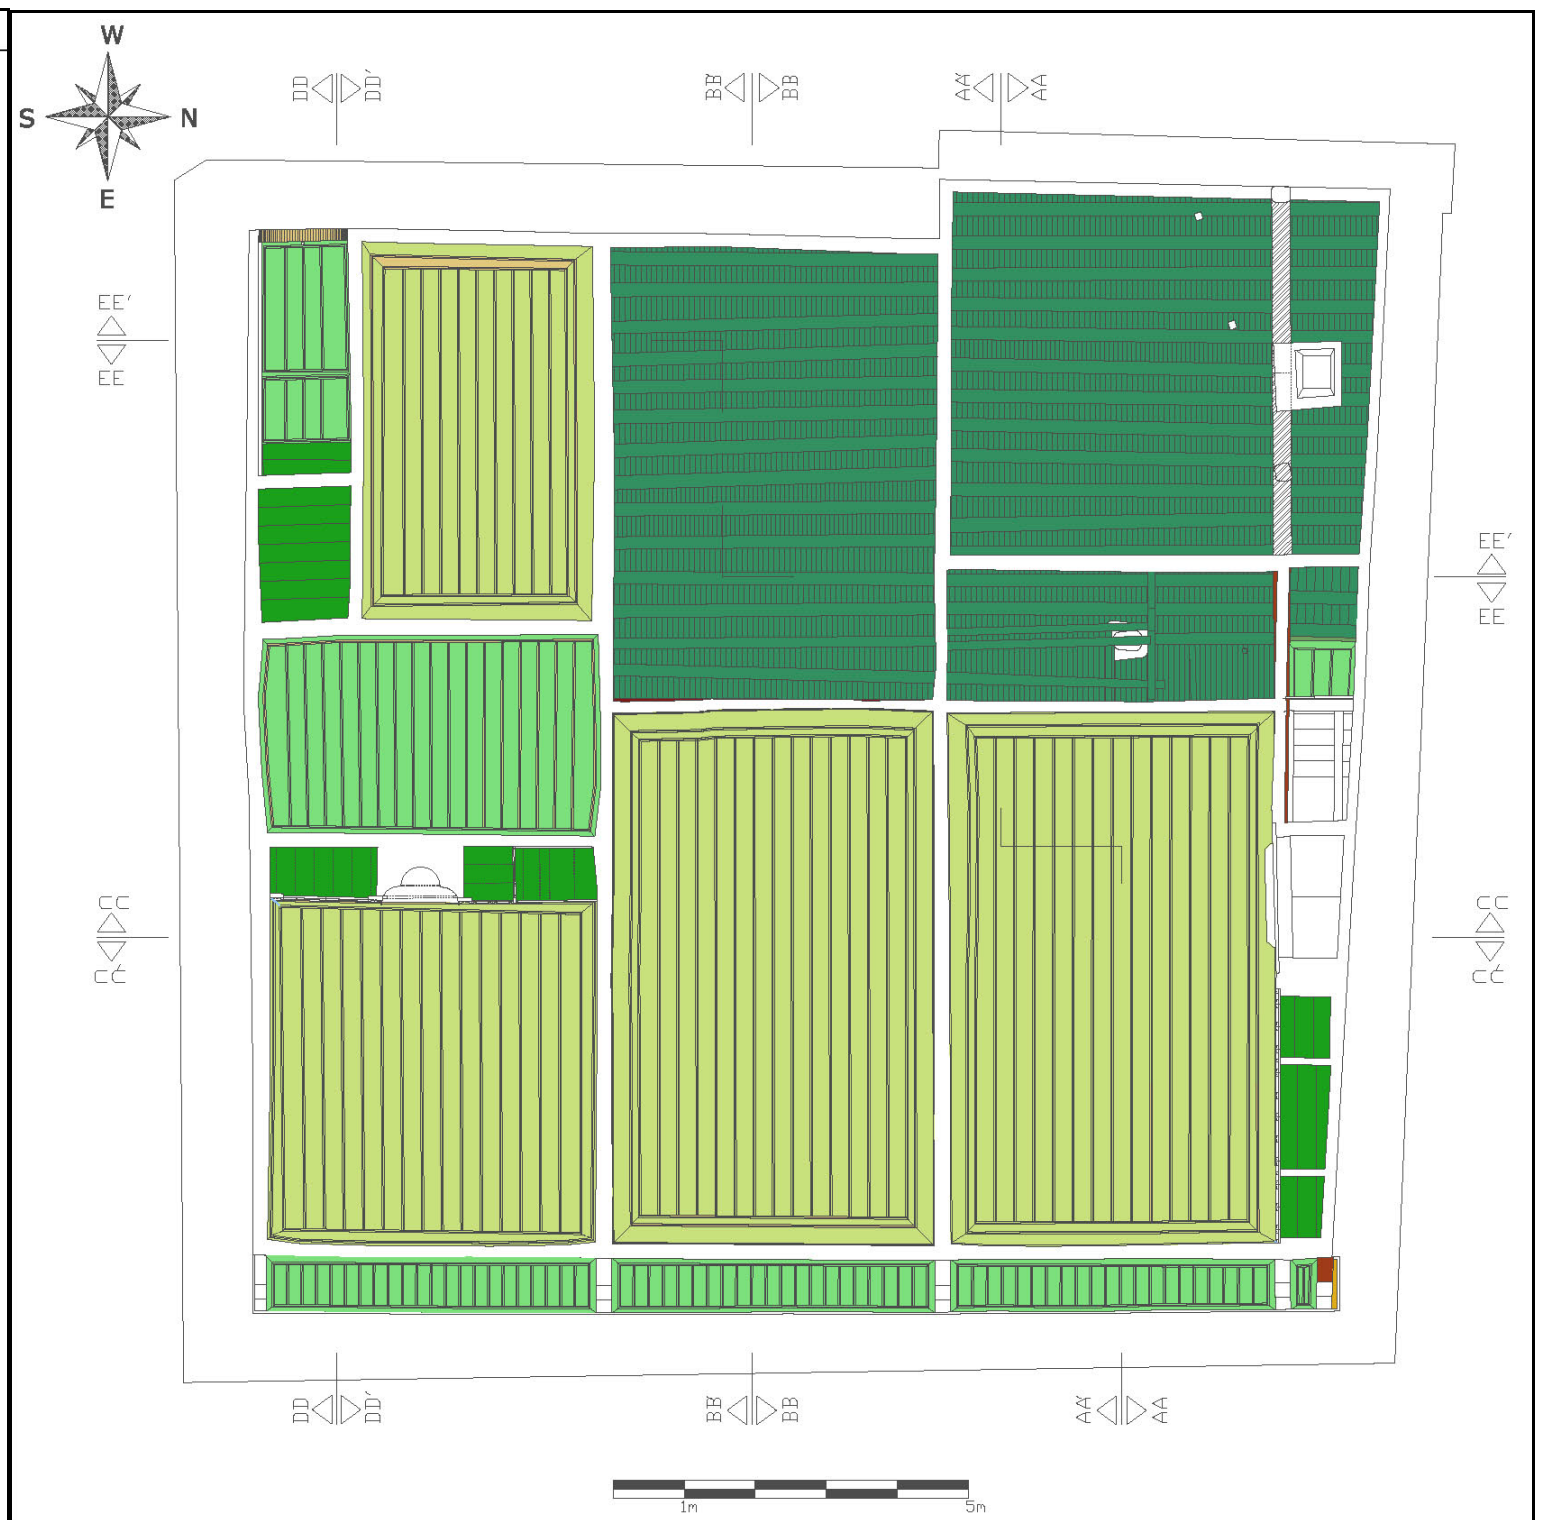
Analysis of S.S. & C.T.; Ground Floor Reflected Ceiling Plan: 1/100 (Pr. in 1/50 at Jury)
